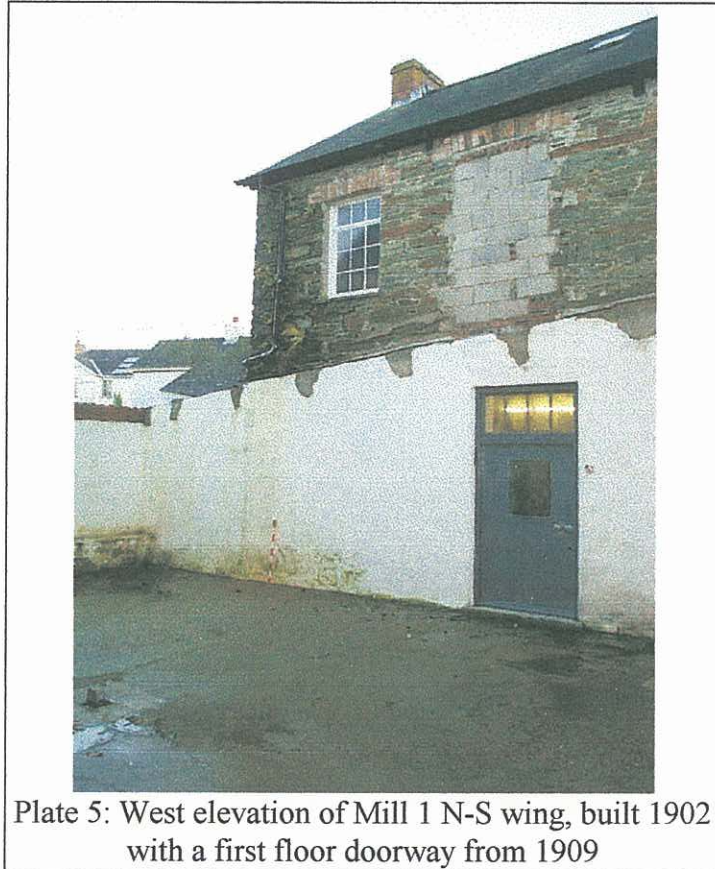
West elevation of Mill 1 N-S wing, built 1902
